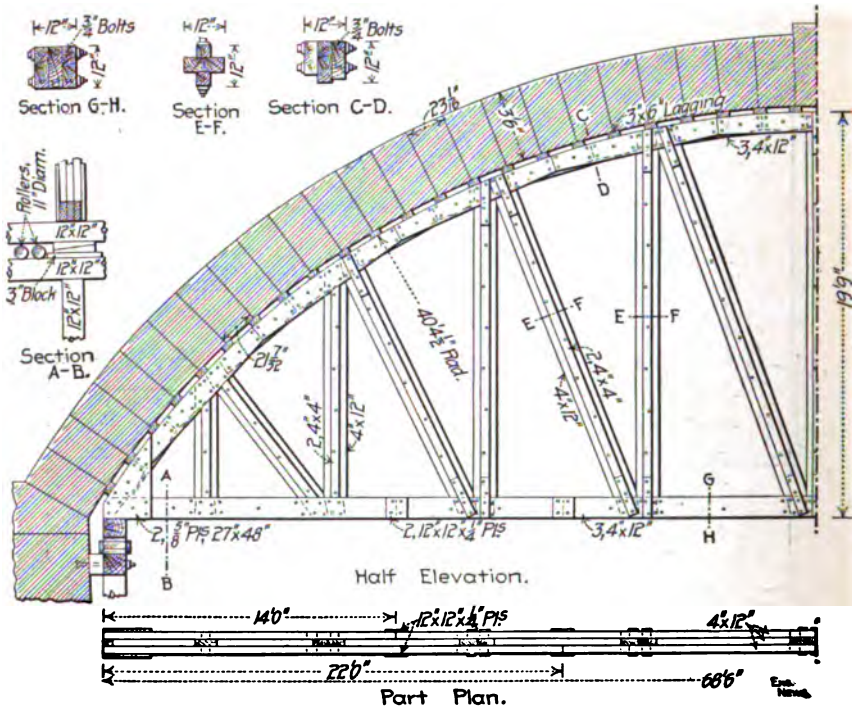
k*. Details of Centers for Rockville Bridge, Pennsylvania Railroad.
